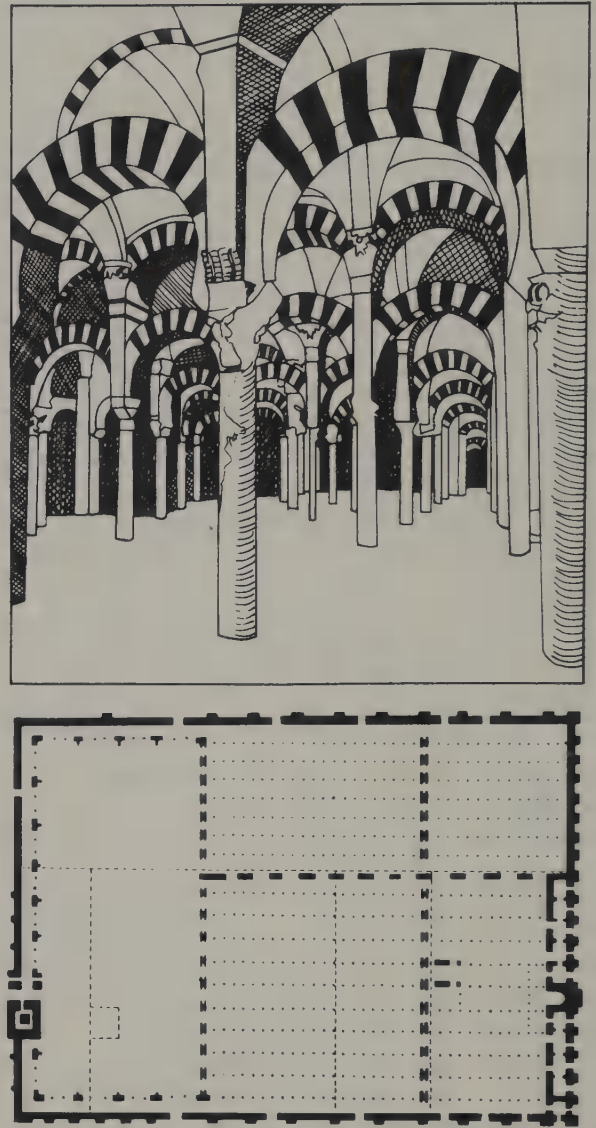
Great Mosque*. Cordova, Spain. Artist's rendering of interior, showing hypostyle, or multicolumned, hall. Floor plan shows successive additions made from the eighth to the eleventh century.
